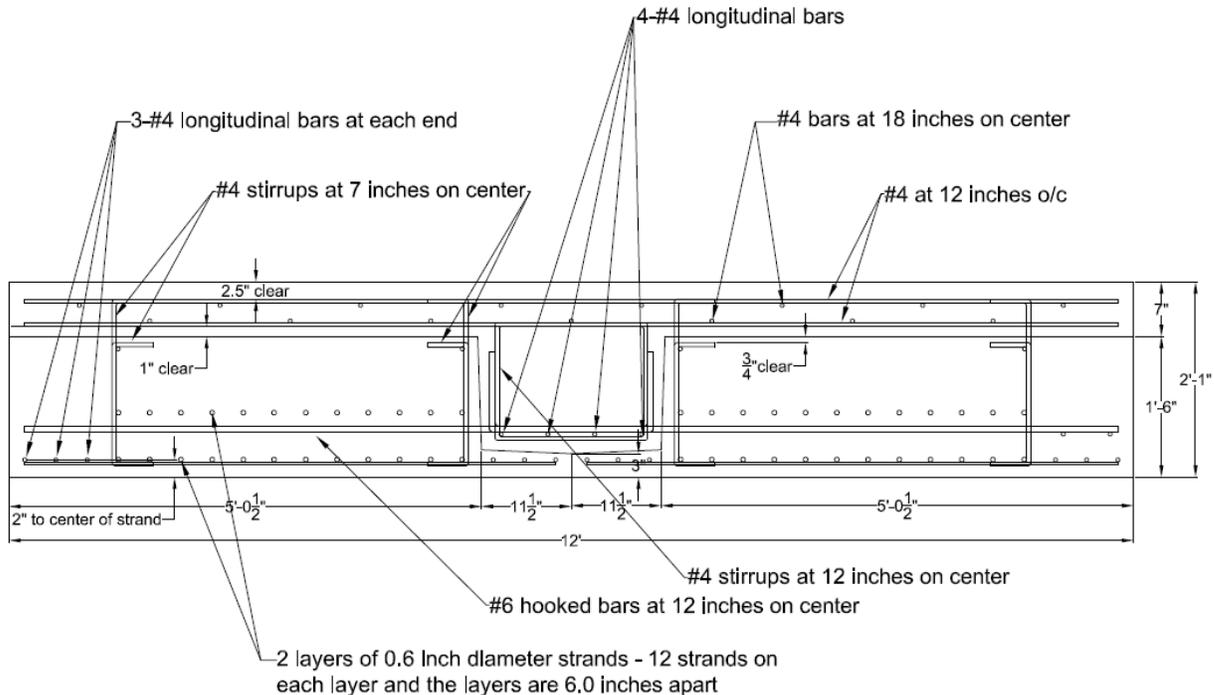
Reinforcing Details for Test Specimen #1 – Straight web cross-sectional shape with extended bars
